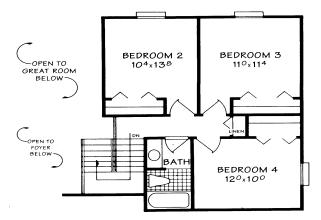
The Princeton Home, Floor Plan, 2nd Floor
